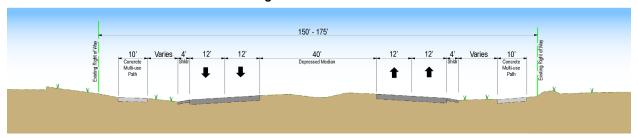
SR 789 Existing Twin Bridge Typical Section
